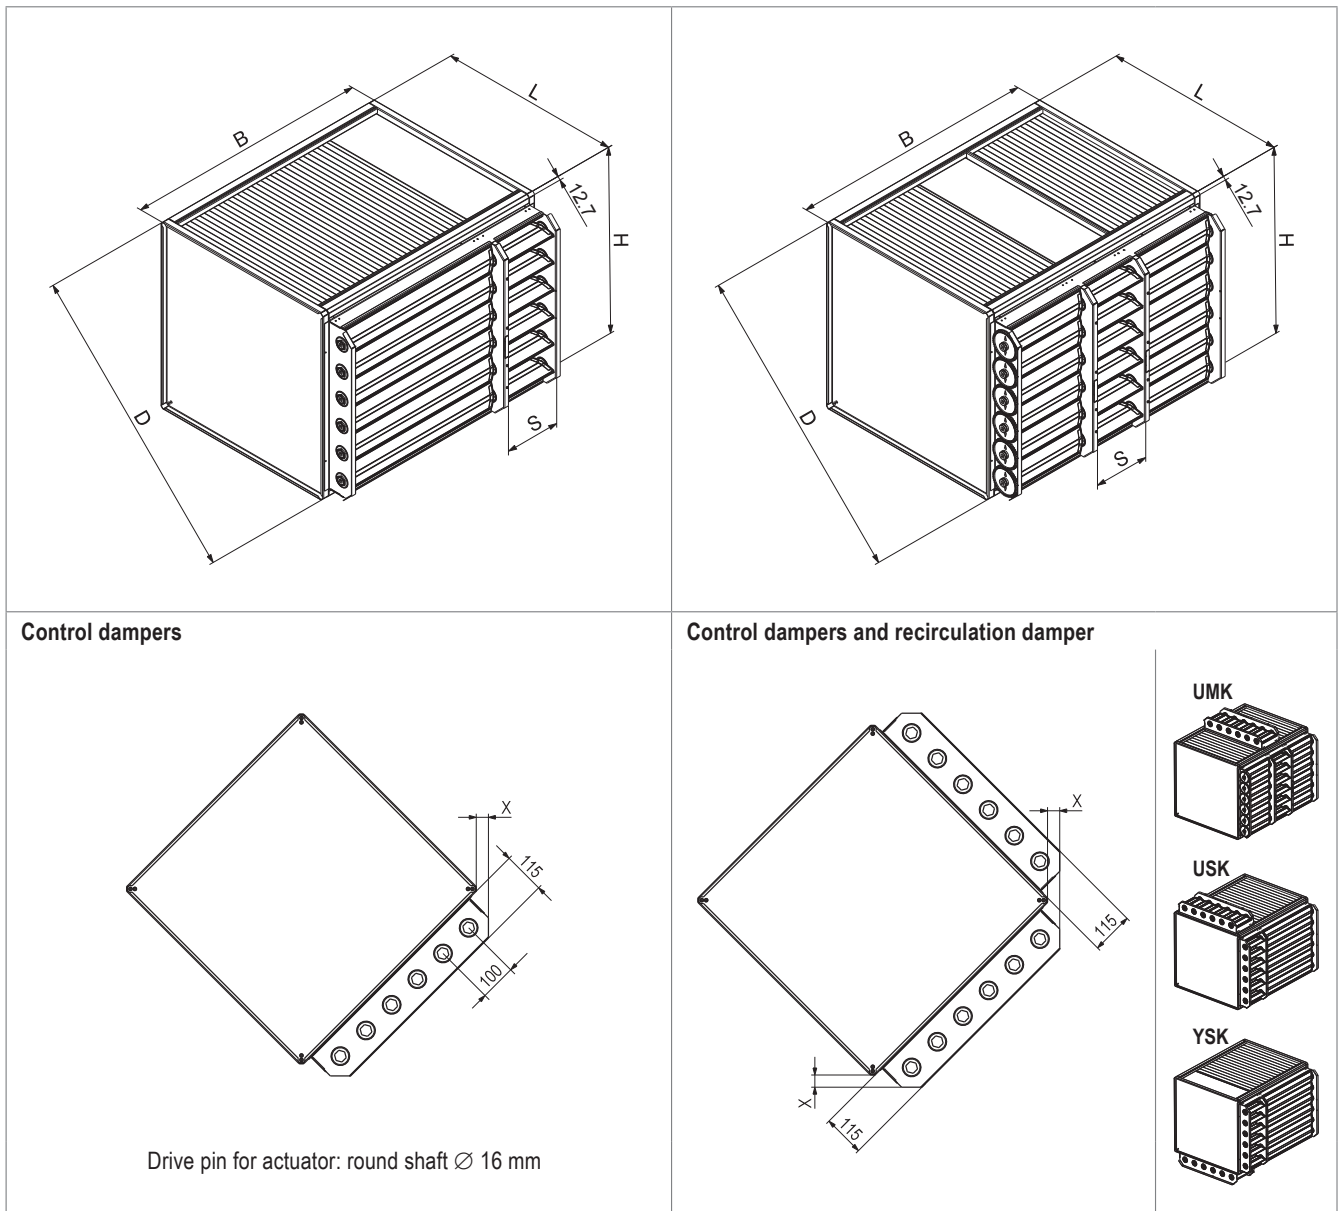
Dimension sheet for Krivan plate heat exchanger with dampers (dimensions in mm)
